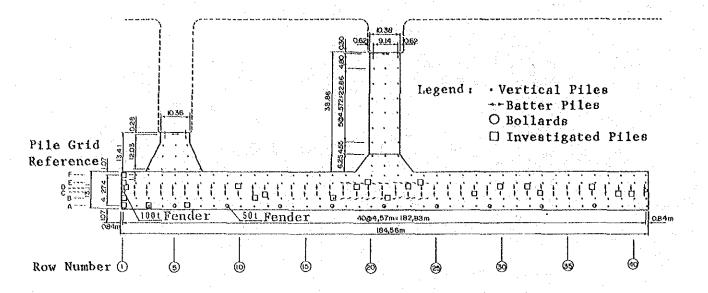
Location of Damaged H-shaped Steel Piles
